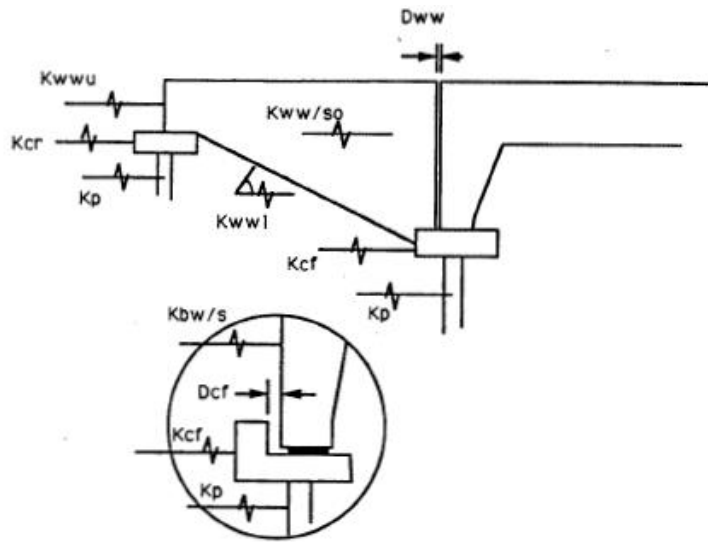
Elevation View of Longitudinal West Abutment Resisting Elements
